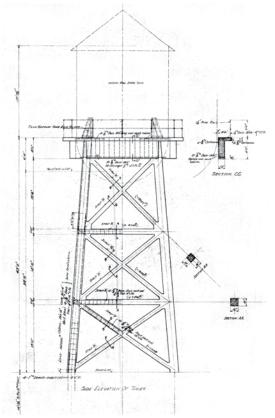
Rooftop water tower elevation from original 1916 Parkinson drawings. Notice support frame is of reinforced concrete.
